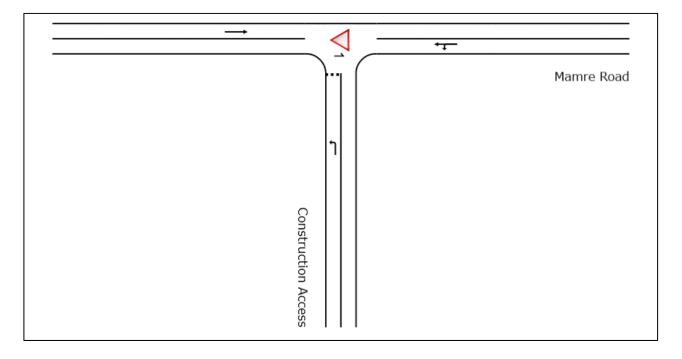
Interim Construction Access Layout Via Mamre Road / LILO
